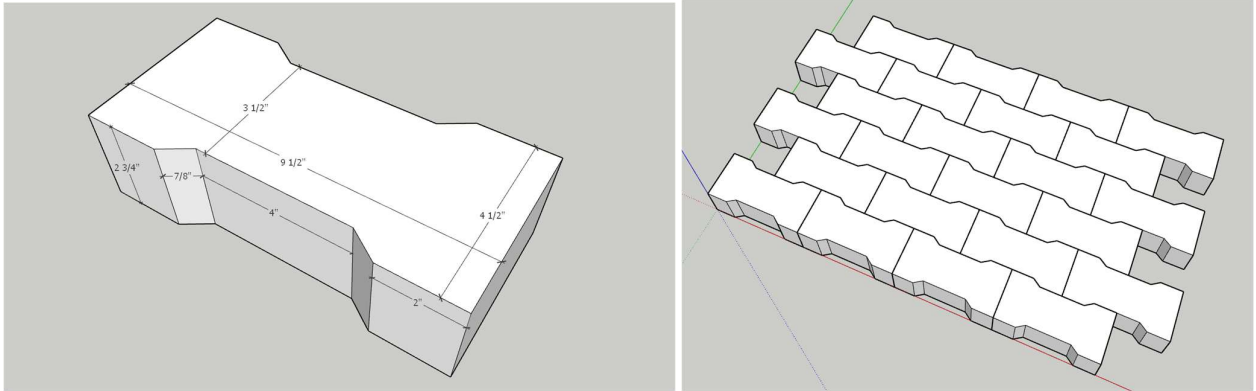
3D Brick Design & 3D Brick Interlocking Bonding.
